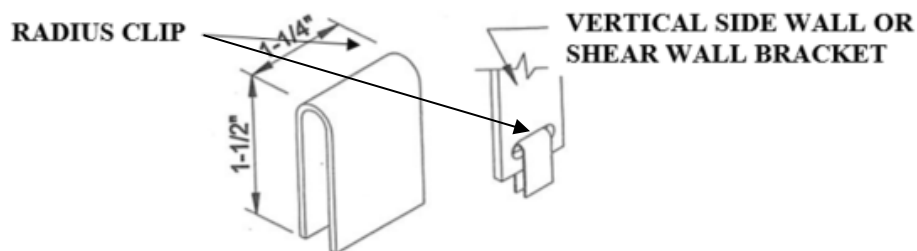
Use of a radius clip inside vertical sidewall and shear wall bracket slots.
